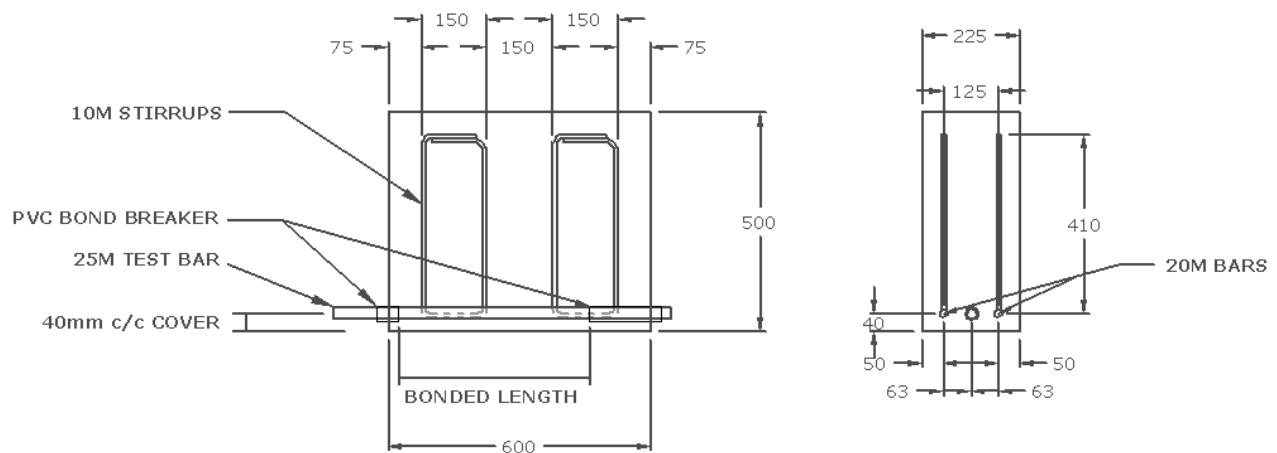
Beam-end specimen cross-section dimensions and reinforcement layout
